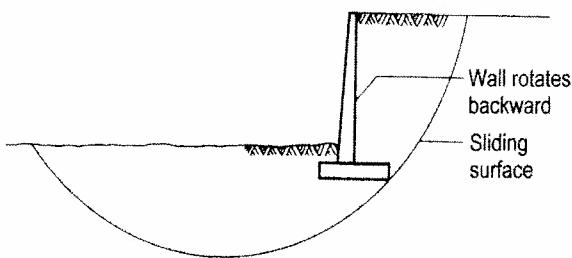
Retaining Wall Overall Stability Failure.
